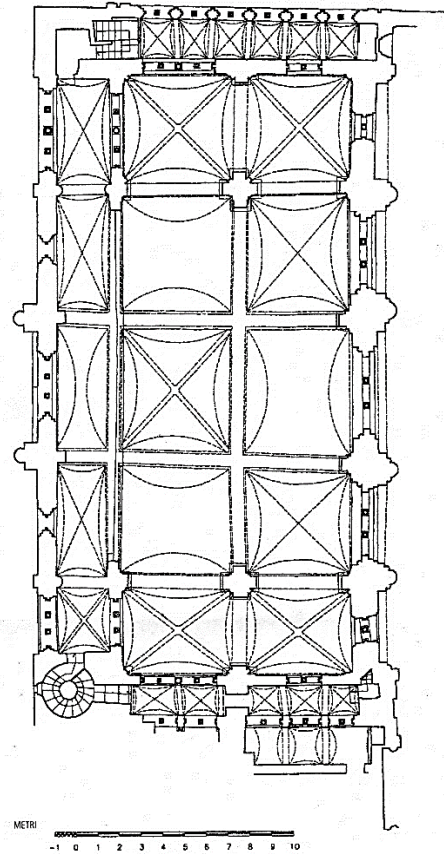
Casale Monferrato, Sant' Evasio, narthex. Plan Andrea Milanese
